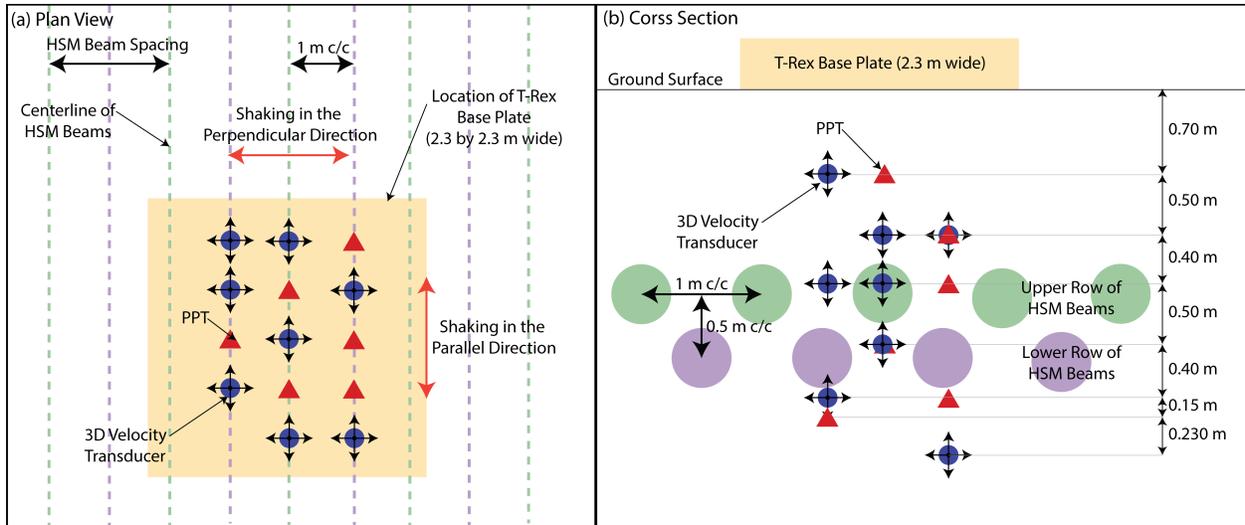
(a) Plan view and (b) cross section of the instrumentation setup, including the Pore water Pressure Transducers (PPT) and three dimensional (3D) geophones, relative to the T-Rex base plate and the HSM beams at the third test panel at Site 4.
